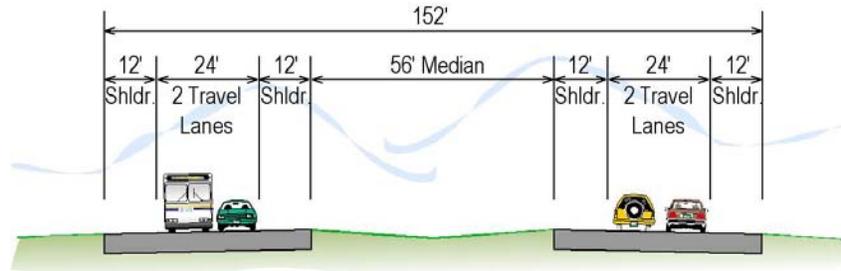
Package A Typical I-25 Cross Section - SH 14 to Crossroads Boulevard
